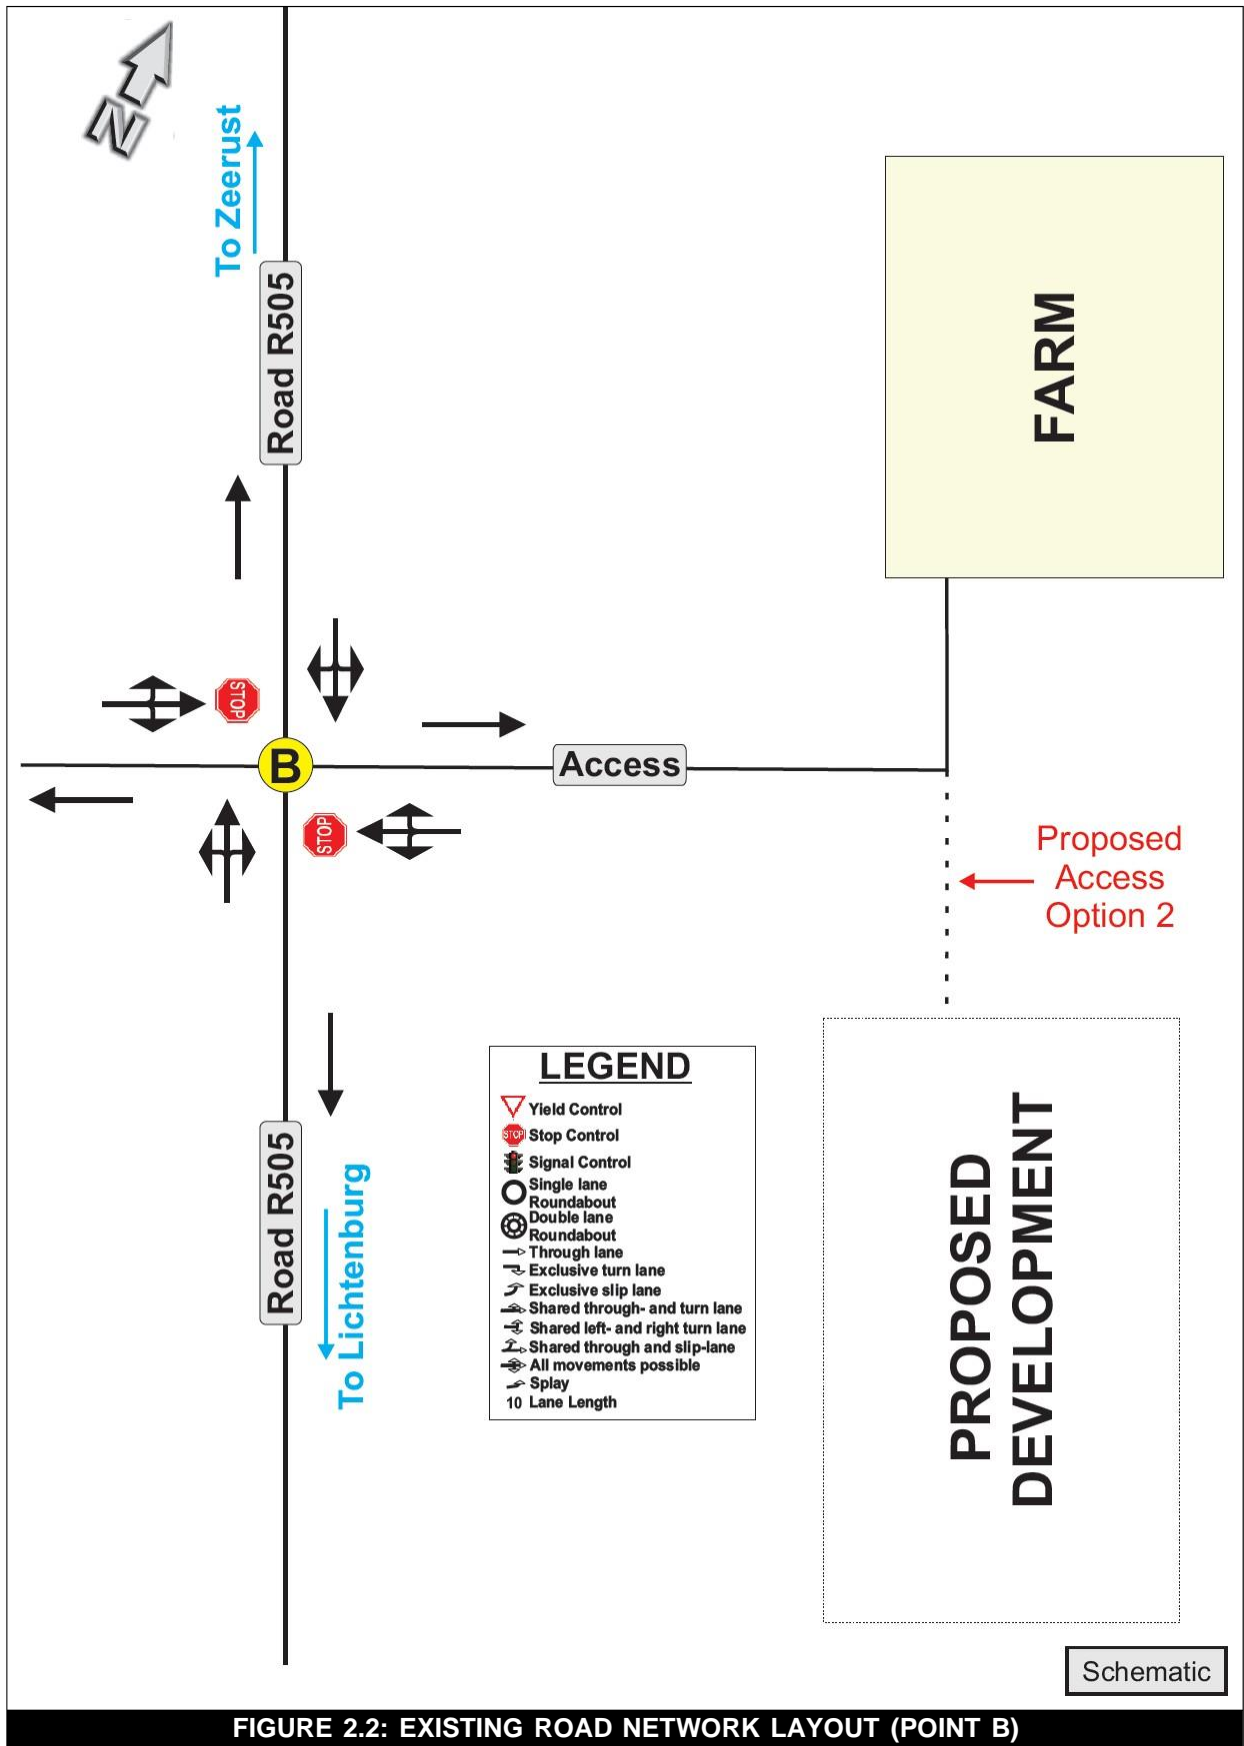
EXISTING ROAD NETWORK LAYOUT (POINT B)
